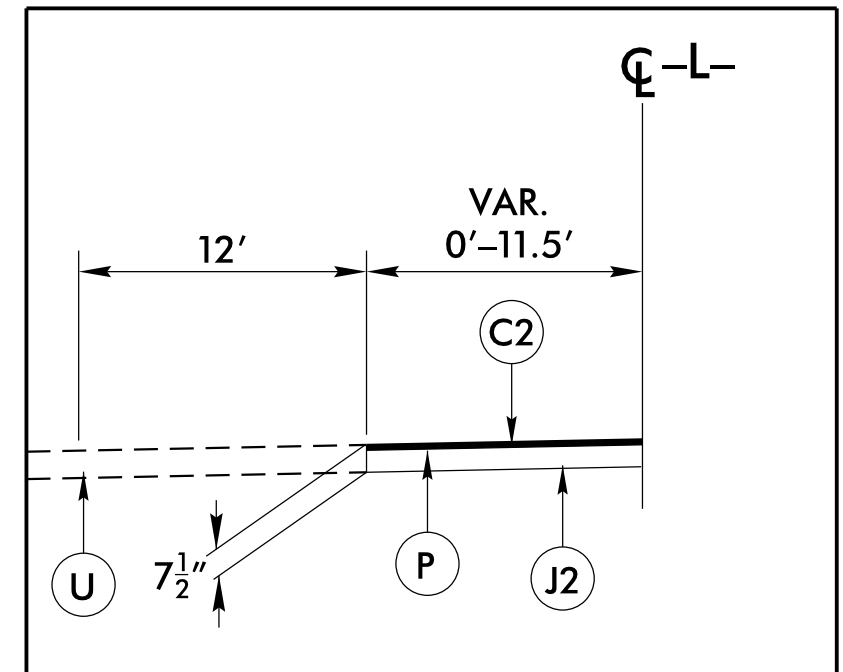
DETAIL OF SHOULDER BERM GUTTER PLACEMENT
